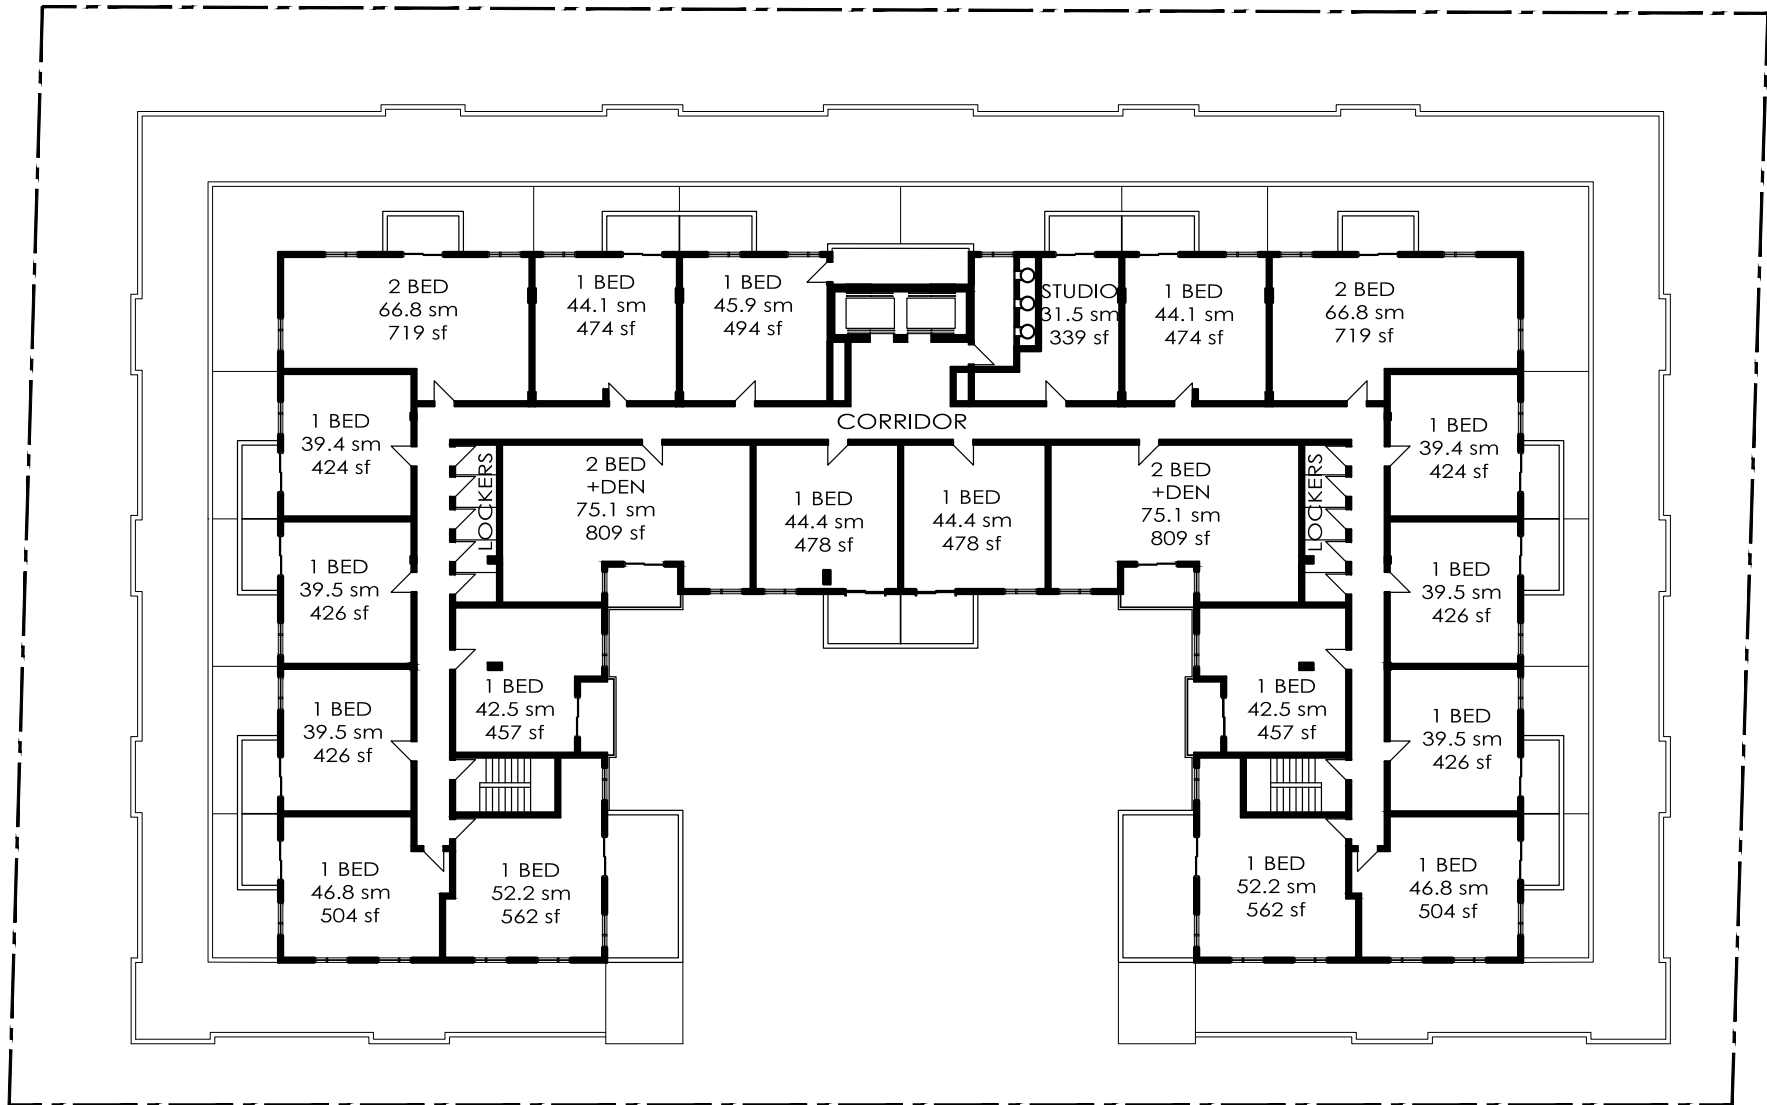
Sixth Floor Plan prepared by Lintack Architects Inc.
